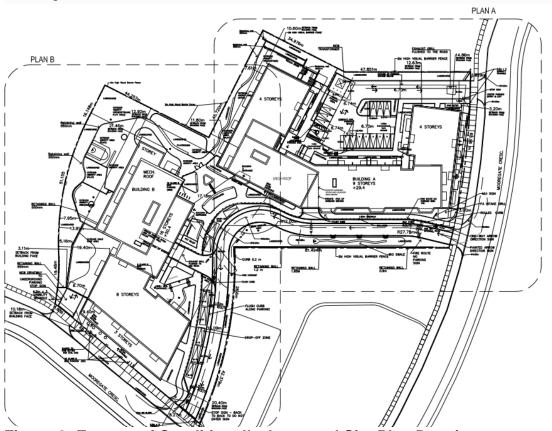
Excerpt of Conditionally Approved Site Plan Drawing
